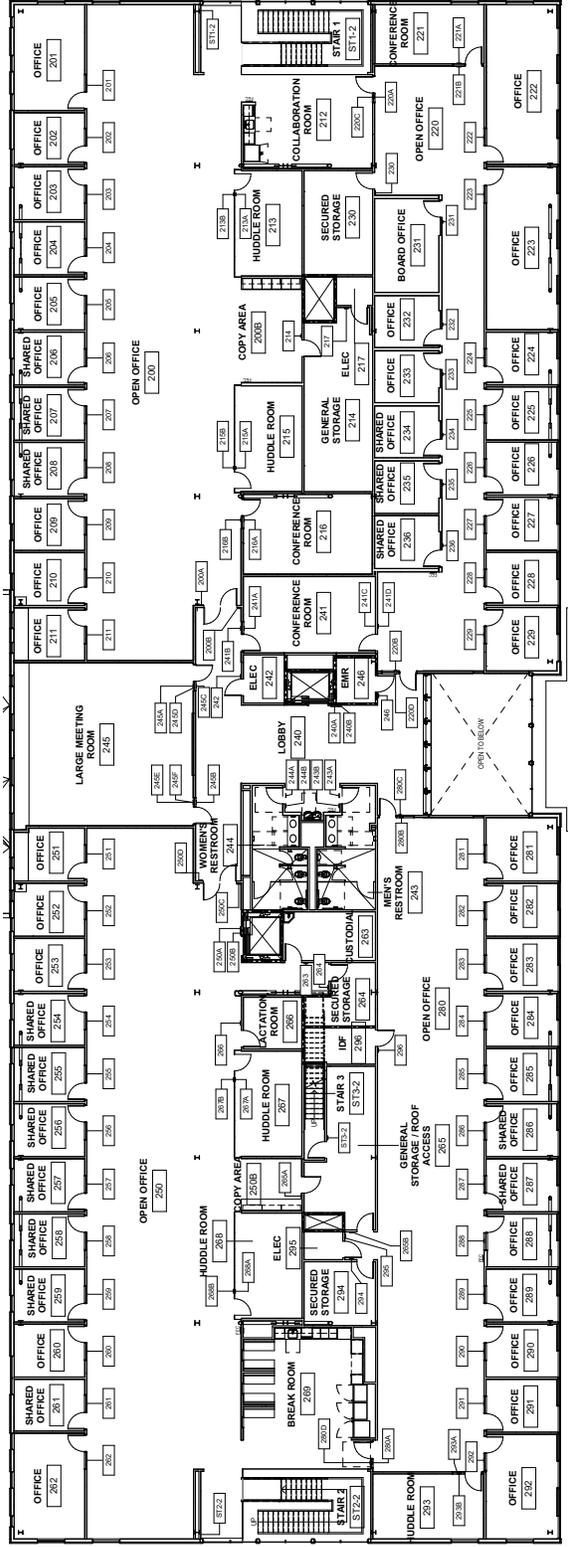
Proposed Cole Administrative Office/Education Center Building, Second Floor Office Plan
